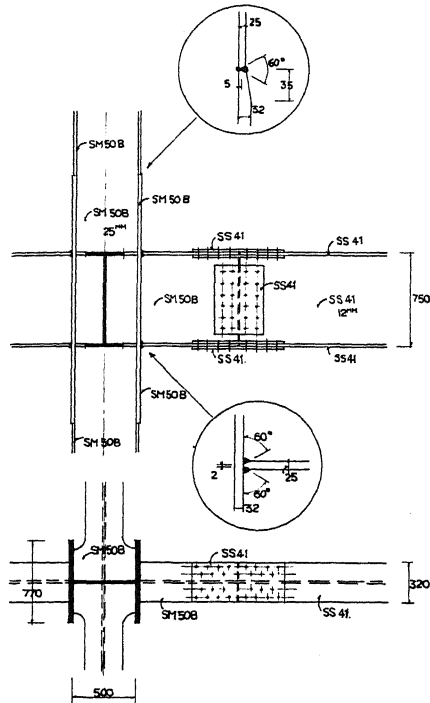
Details of Beam-column Joints and Erection Joints of Beams---Second Floor Beam---Unit:mm.
